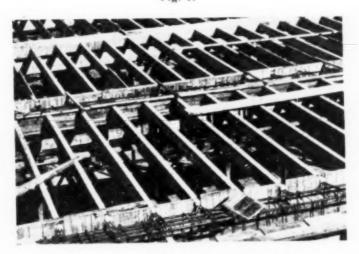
Precast Beams laid on Shutters of Main Beams.
